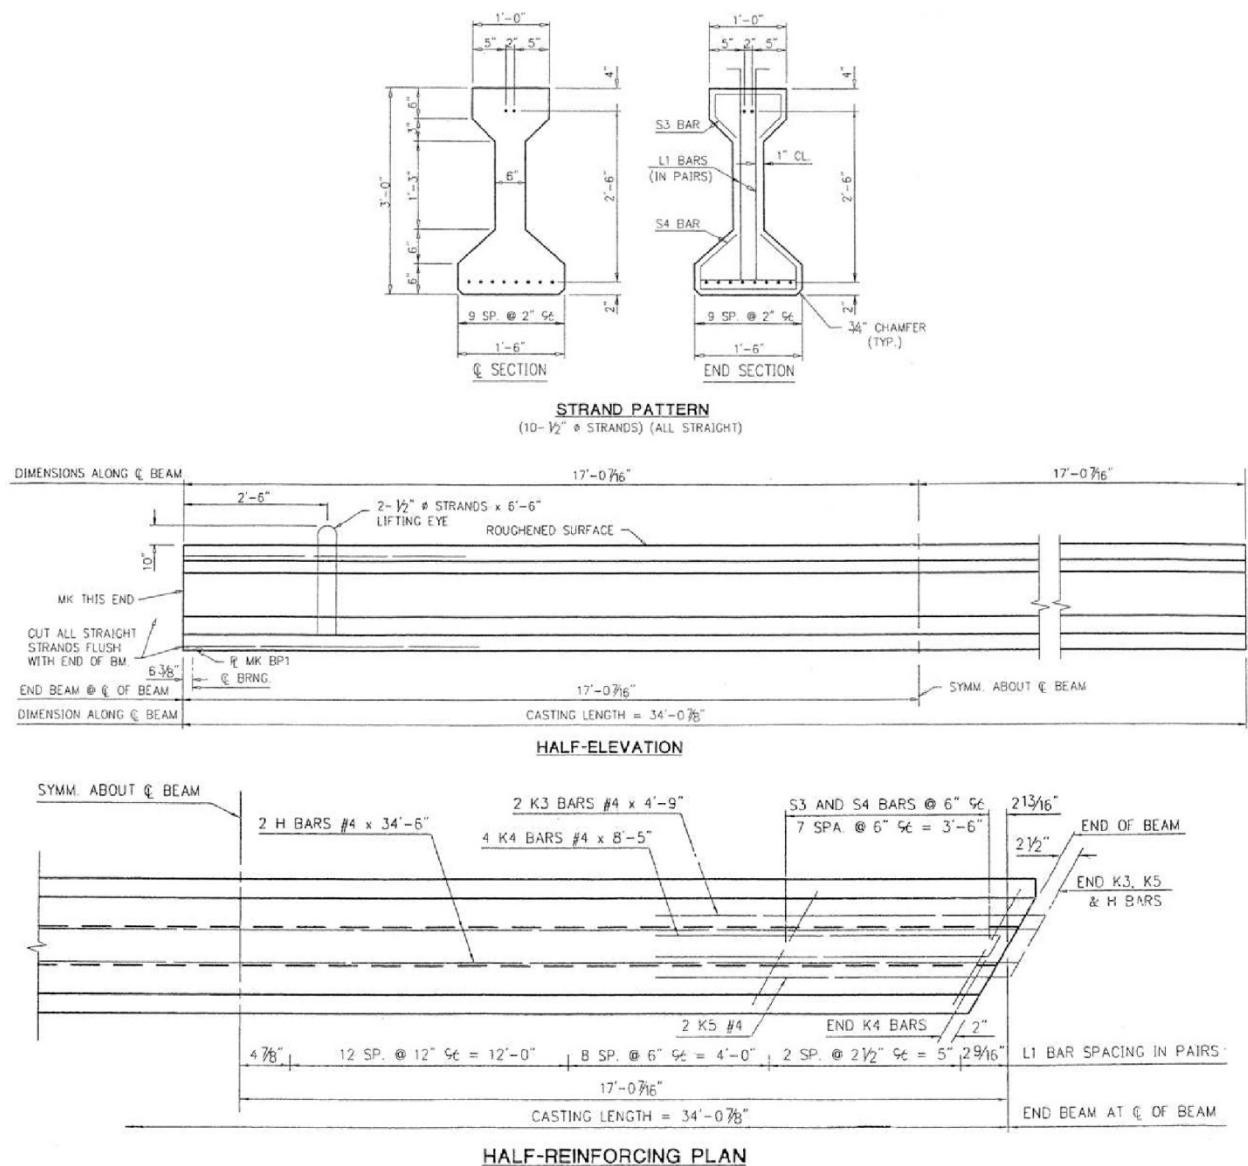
Elevation and details of the selected Wild Horse Creek Bridge girder (Coreslab [2007]).
